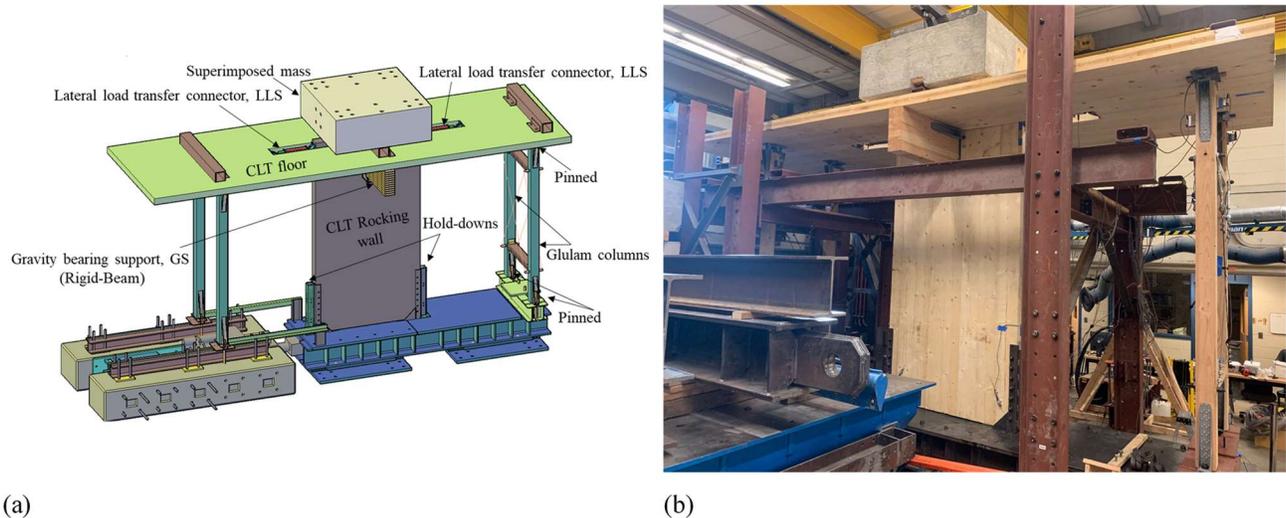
Full scale Laboratory test setup and layouts a) Test setup layout b) Laboratory test setup
